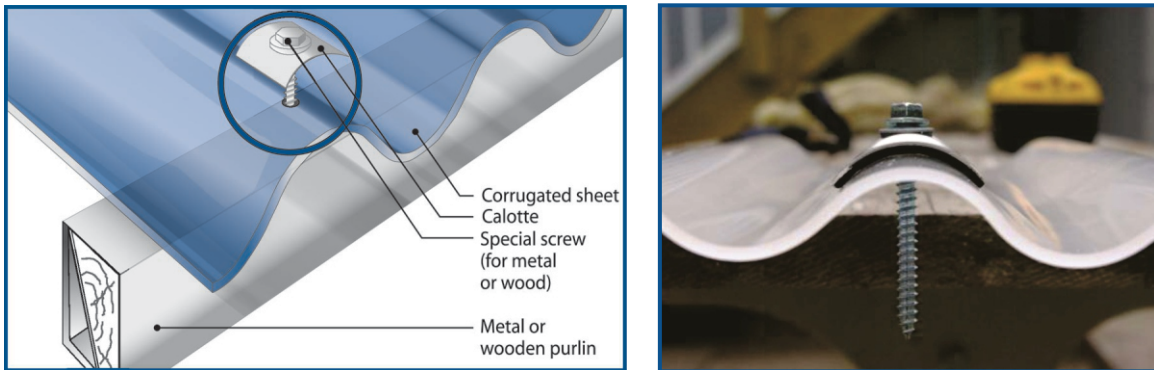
Point Fastening of Corrugated Sheet to Cross Member
